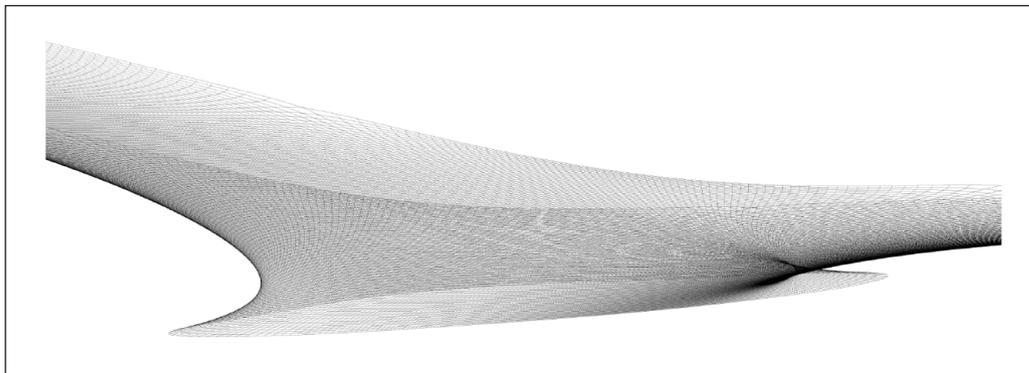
Detail of bridge in Figure 9 showing structural grid.
